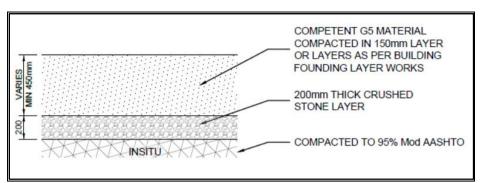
Excavation for road layerworks at depth (source: Walters, 2020)
